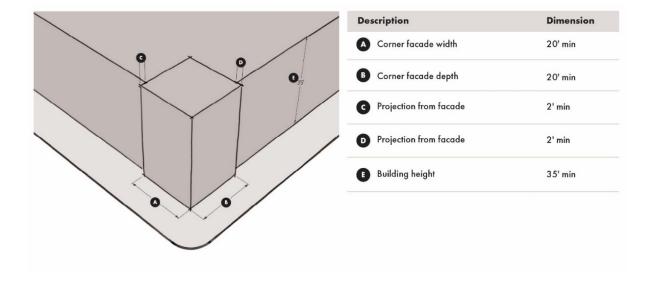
BB: Corner lower that the roof of the rest of the building.
